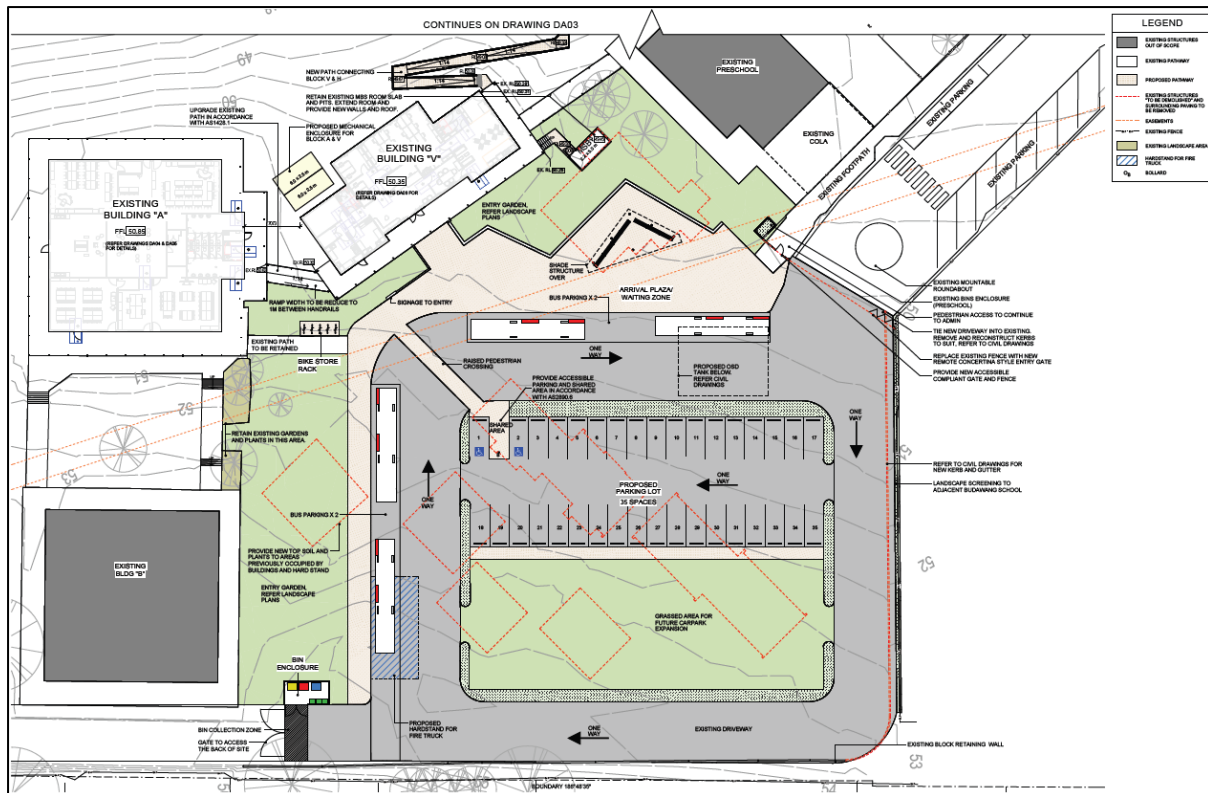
Extract of Part Site Plan 1 – Buildings to be Demolished in Red
